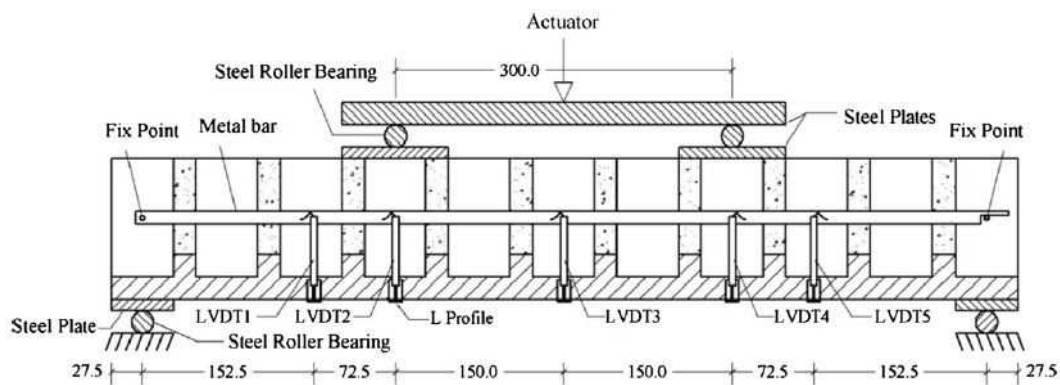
Four-point beam bending test setup (all dimensions are in mm) [14].
